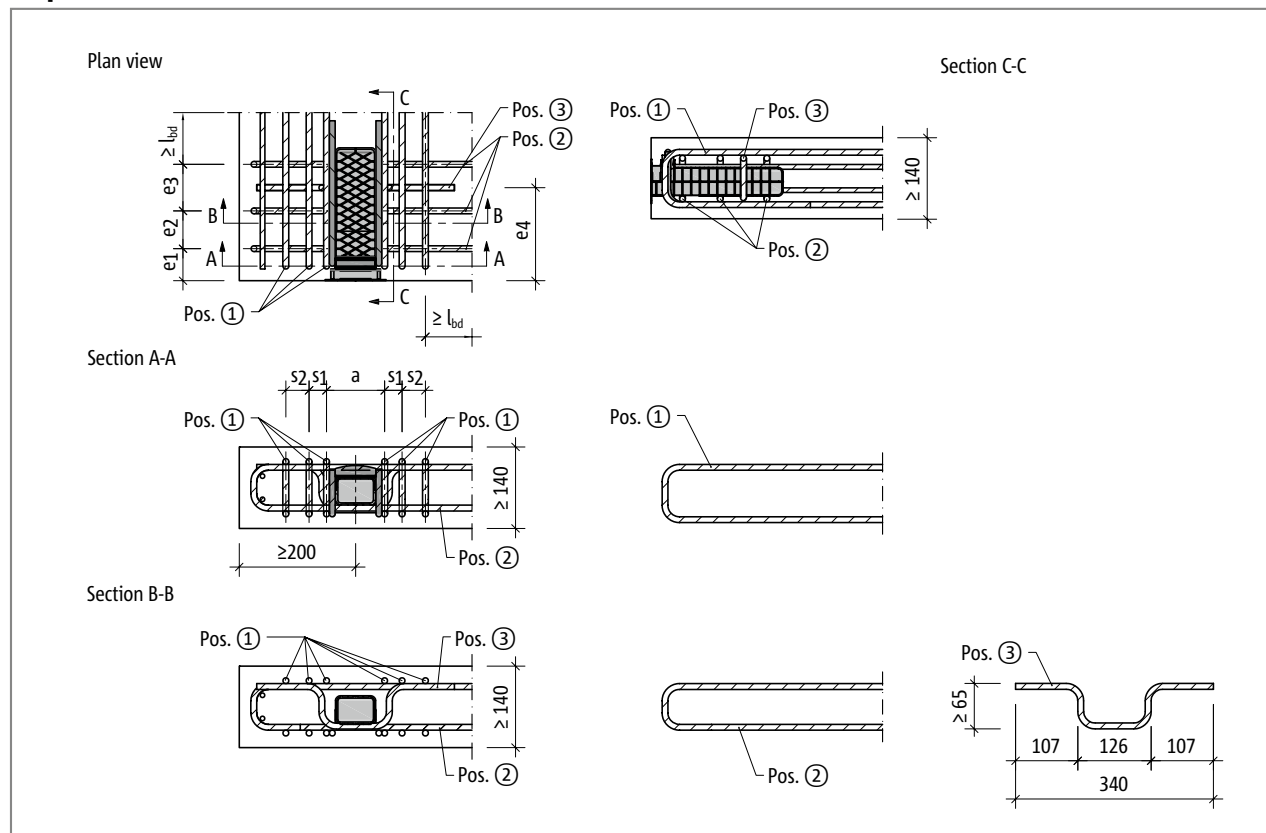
Schöck Tronsole® type Q: On-site reinforcement
